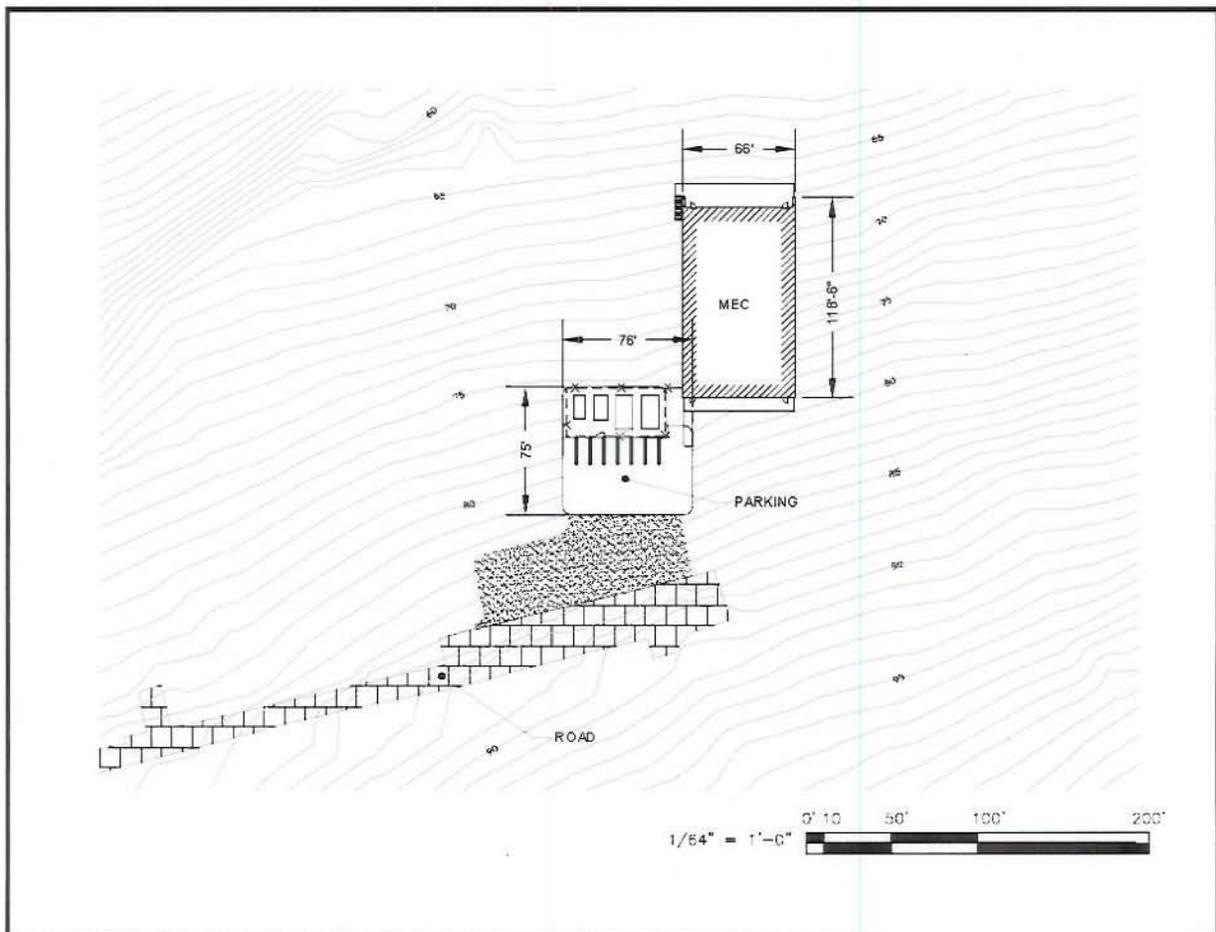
Proposed layout of Mertarvik Evacuation Center (MEC).
